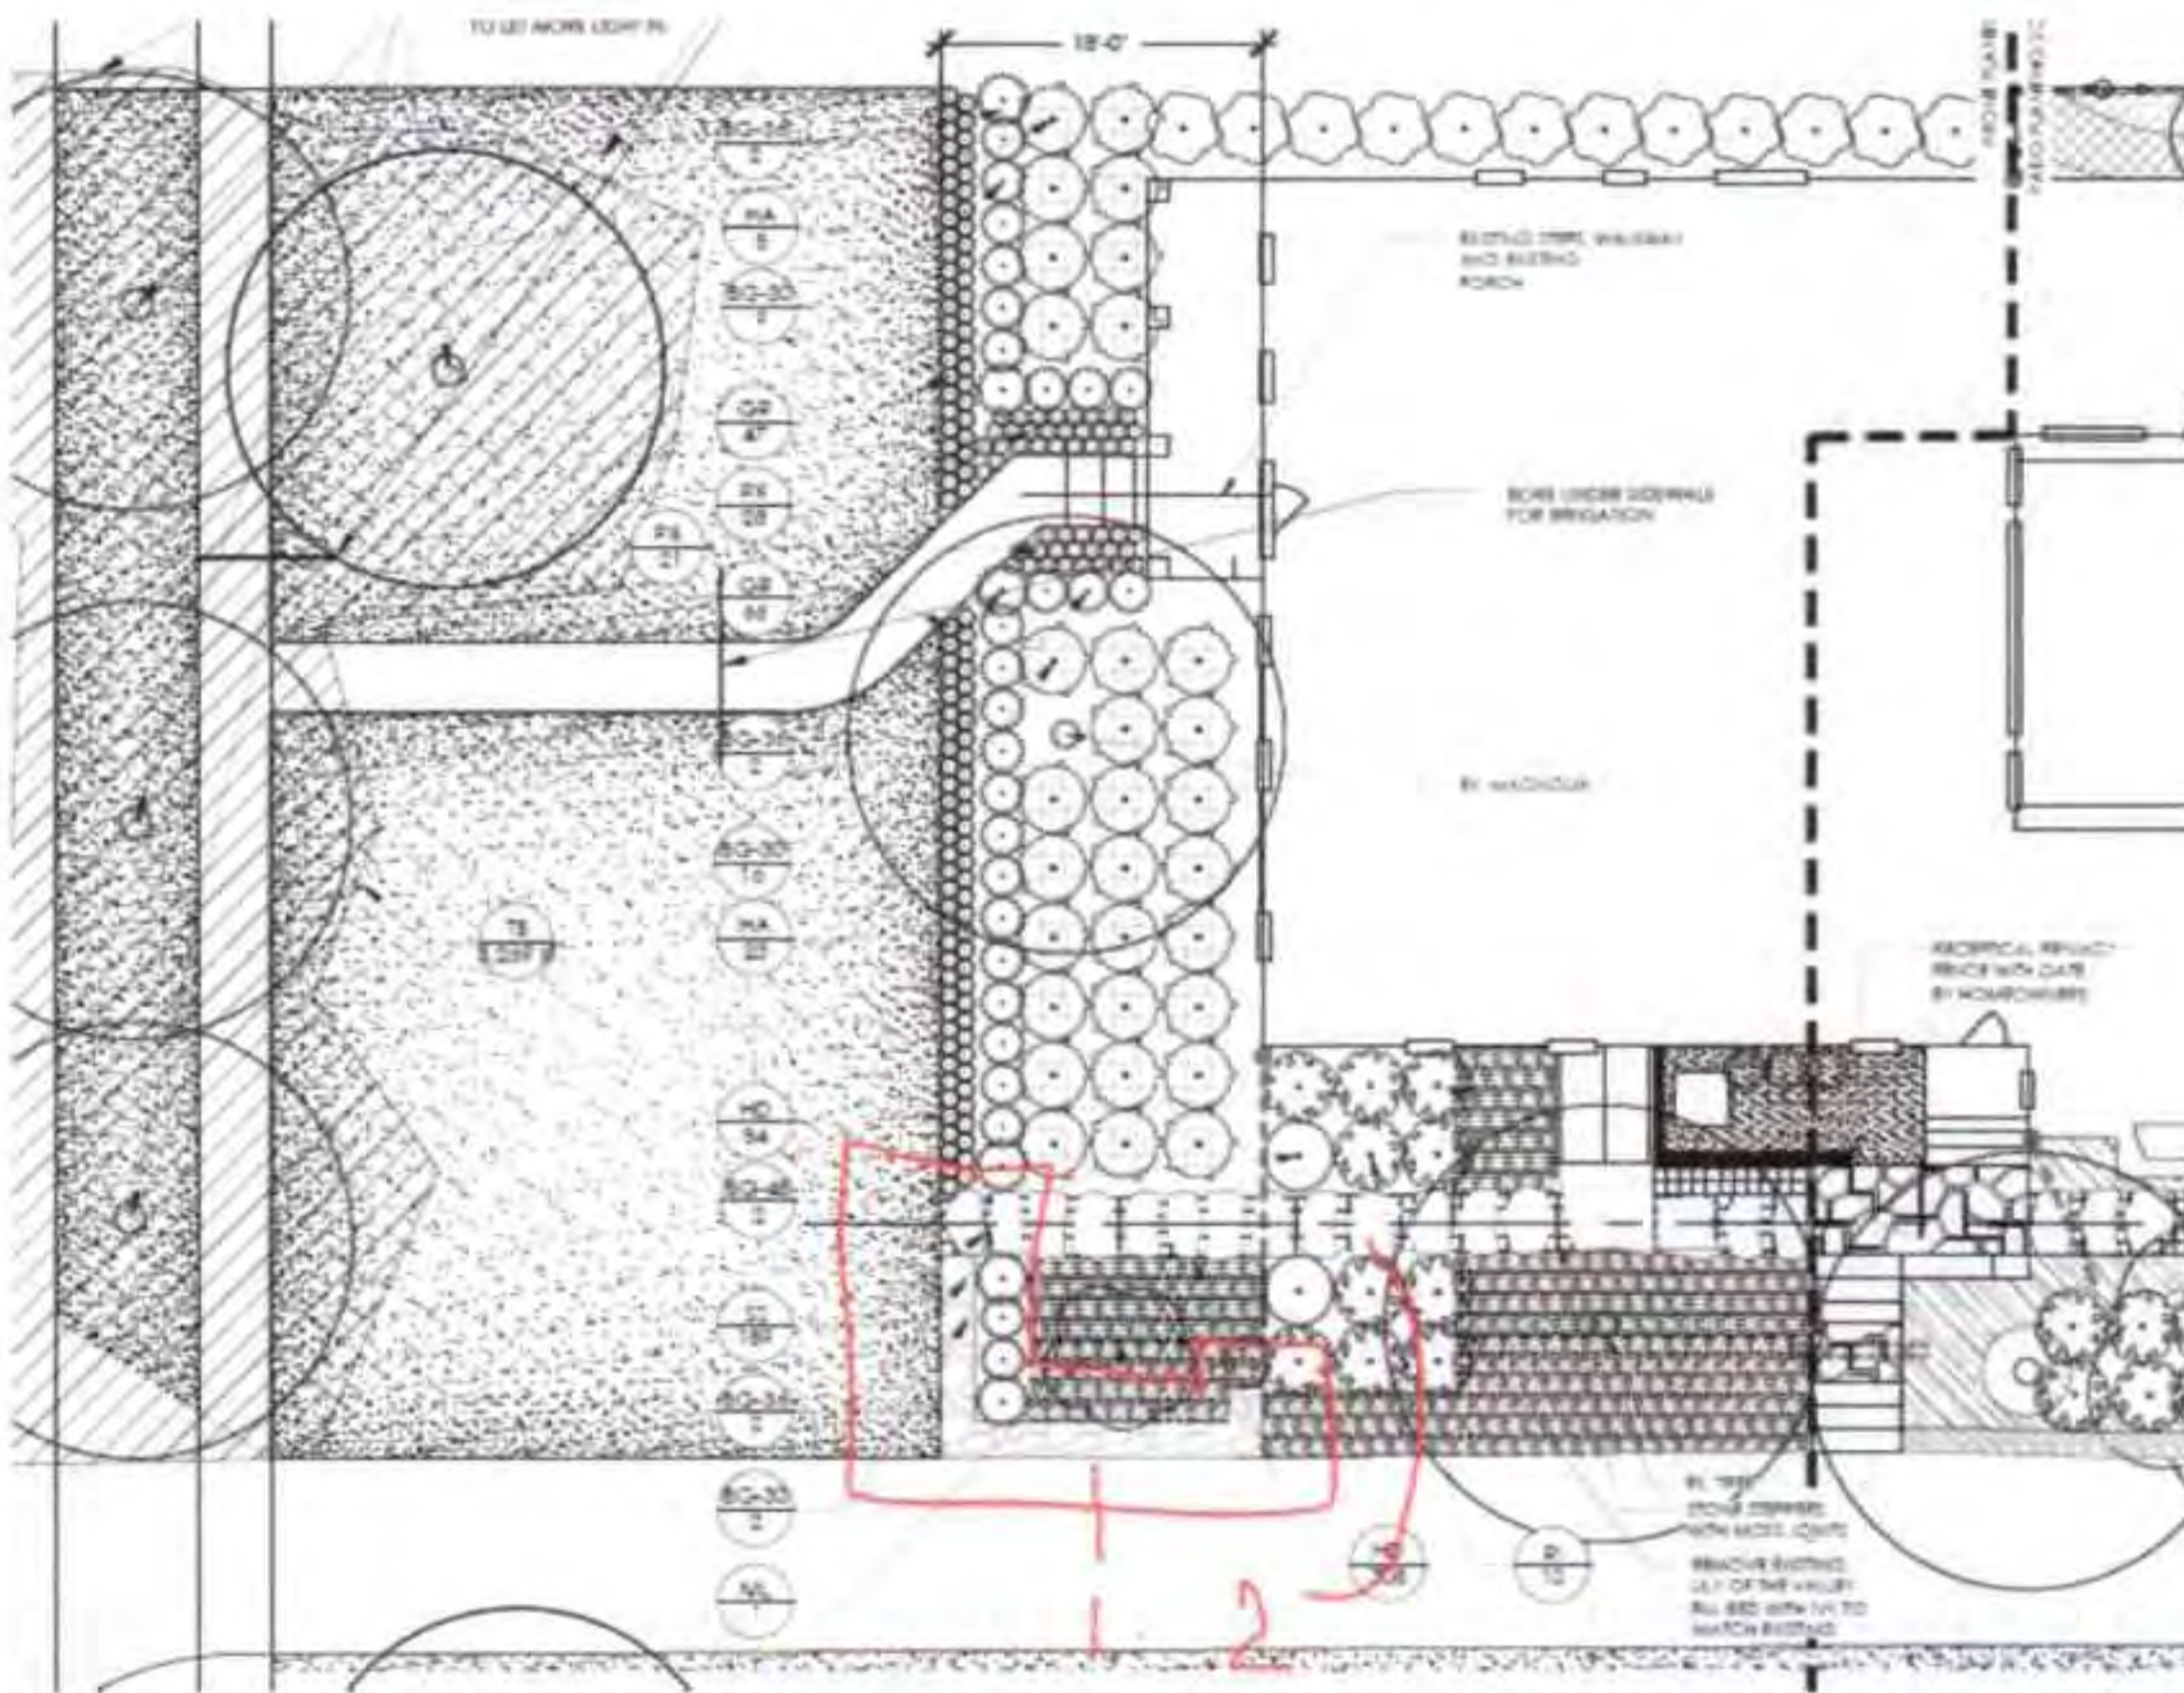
(1.) The above red outline shows the proposed wall location along the driveway to hold the grade. (2.) Shows the stepper walkway to connect to the rear garden. Please see attached plans for more details.
